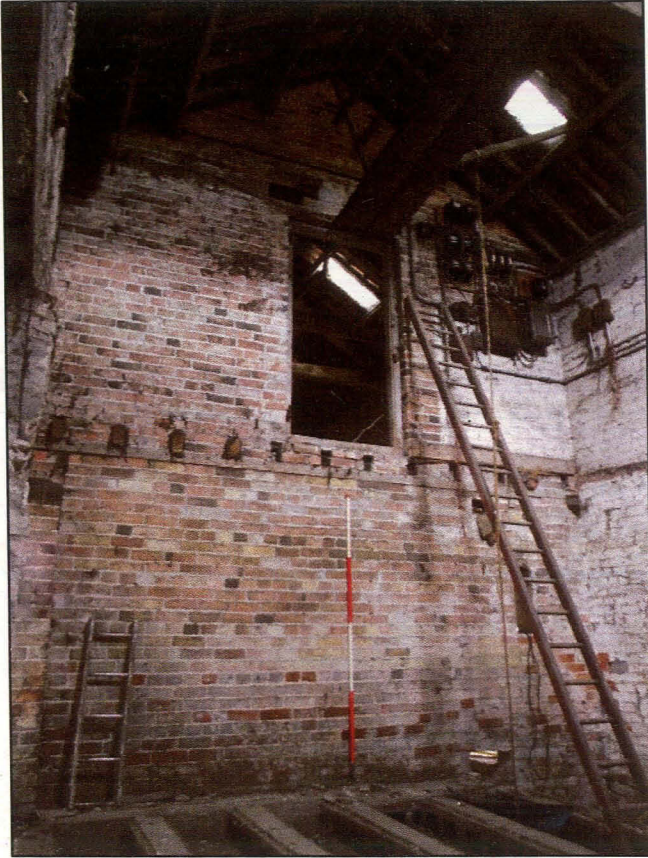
(Shot 61): East-north-east elevation of barn B6 with first floor opening to threshing barn. A walkway is attached to the roof and remains of wooden floor beams are visible under the opening. Looking south-east
